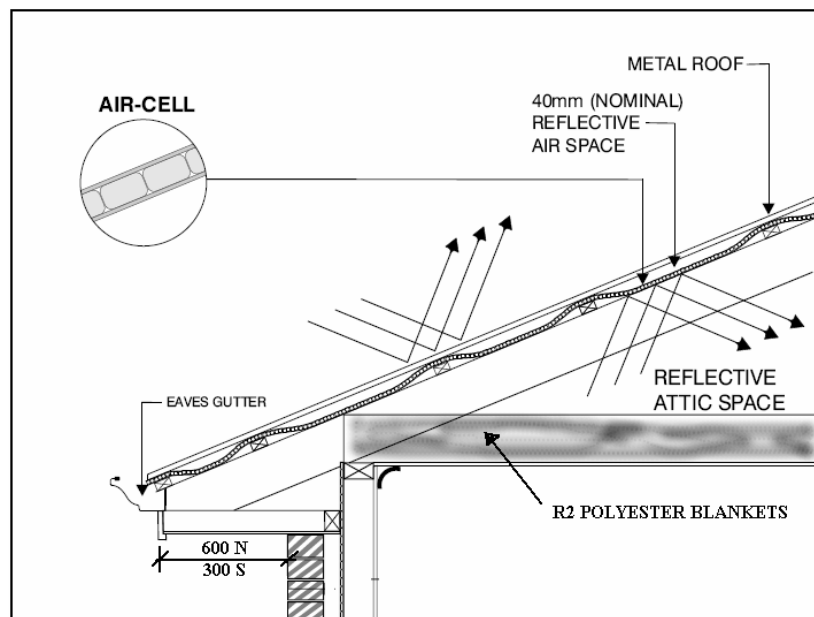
Section through roof (Source: www.air-cell.com.au)
